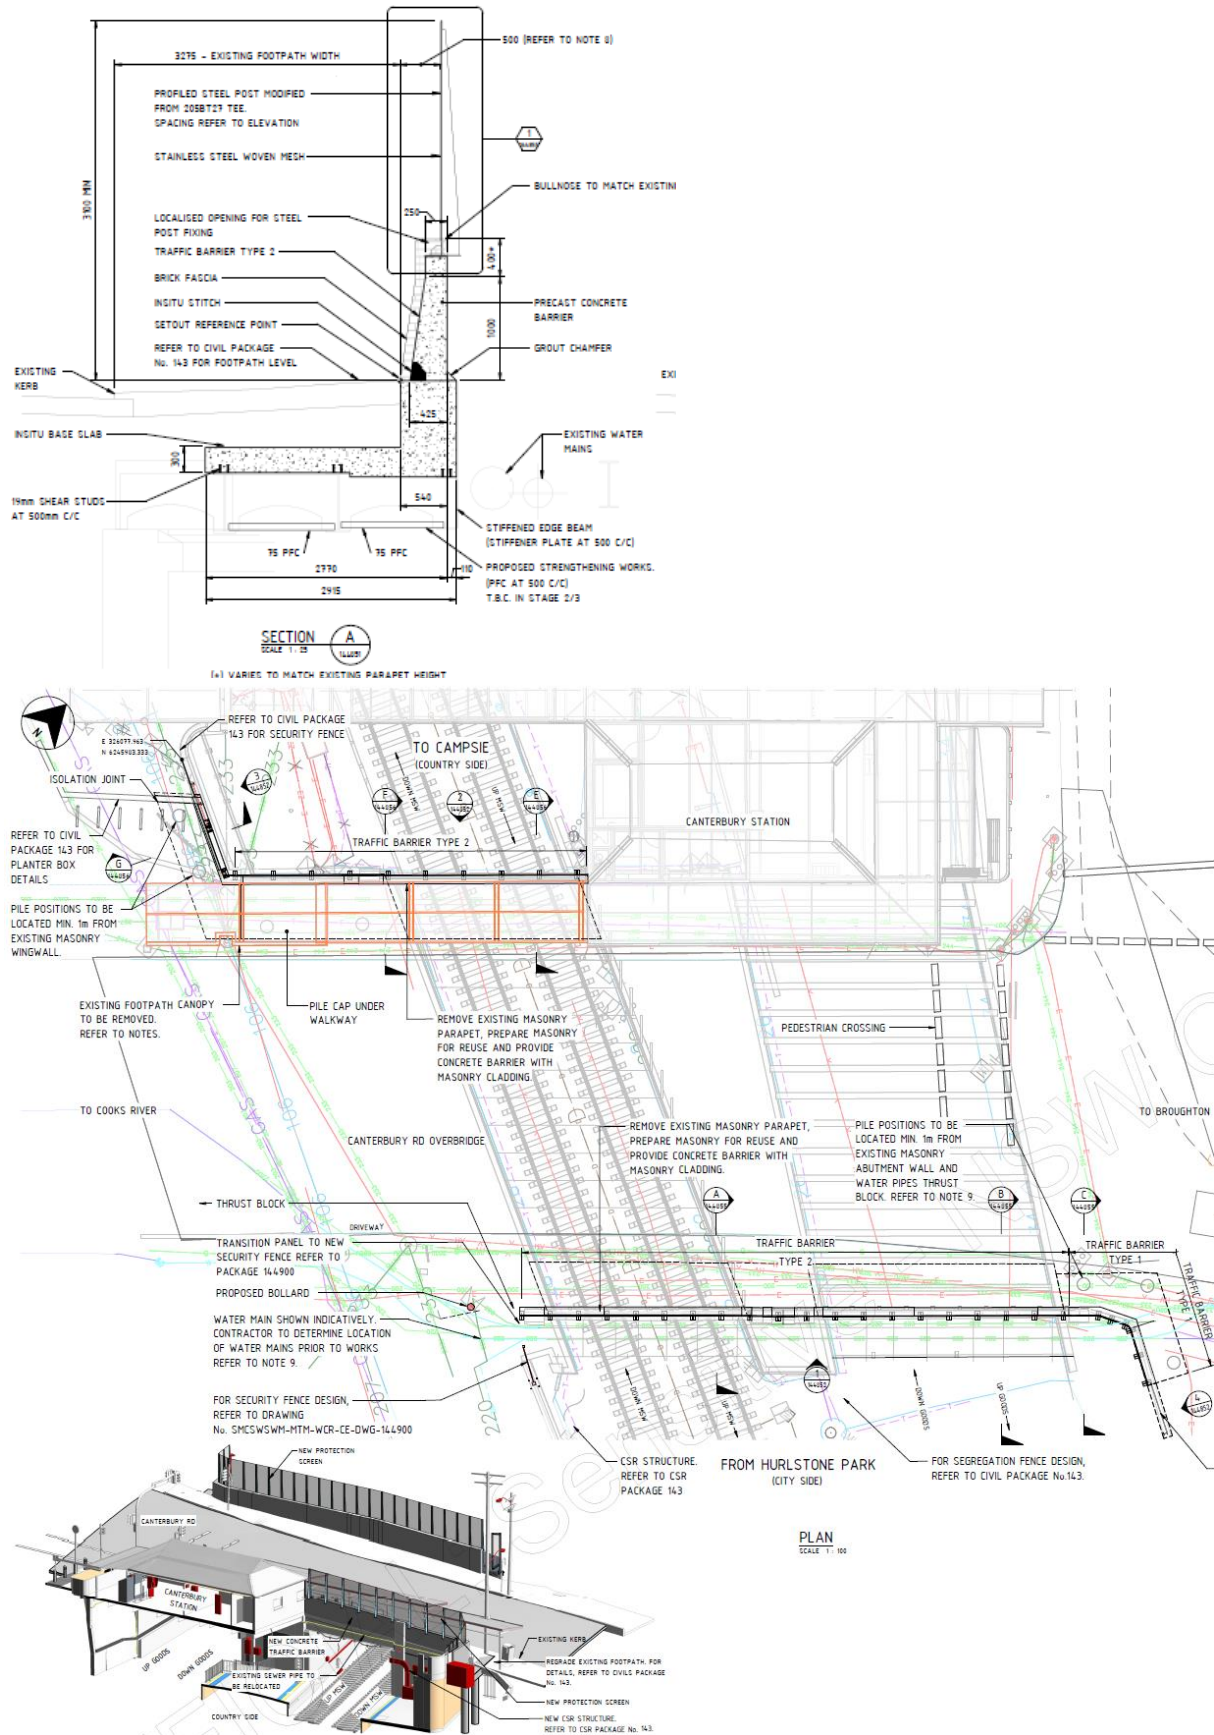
Plans of treatment works for Canterbury Road Bridge (Source: Metron T2M 2022, provided by ARCH Artifex)
